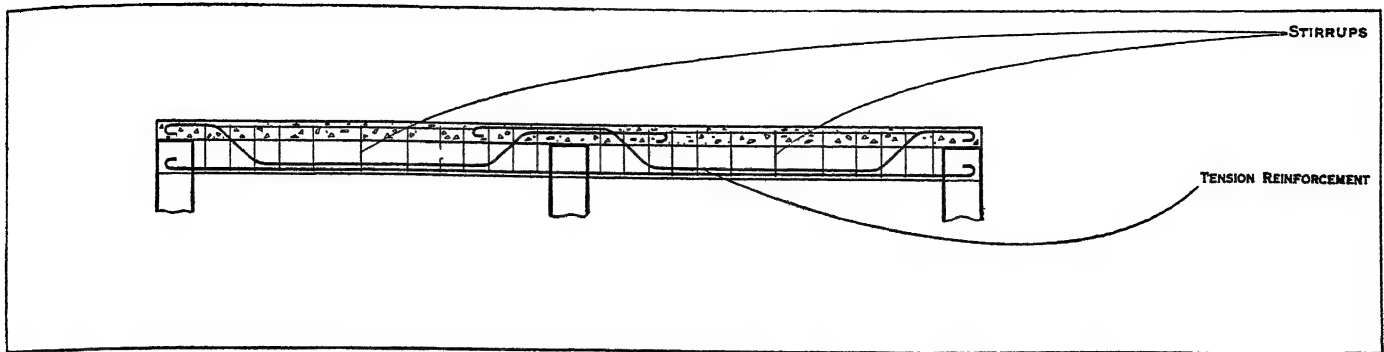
DIAGRAM SHOWING LONGITUDINAL ELEVATION OF CONCRETE BEAM
